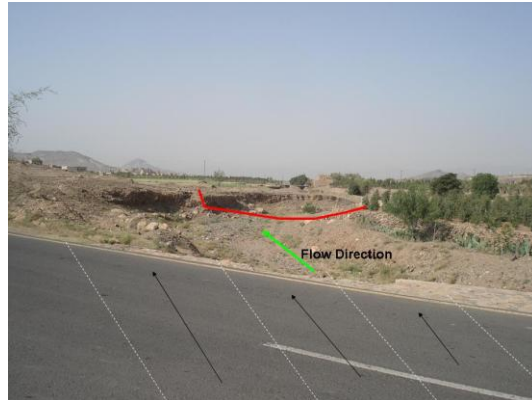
Downstream view from the proposed station showing the cross-section of the downstream area and the culvert alignment under the road
